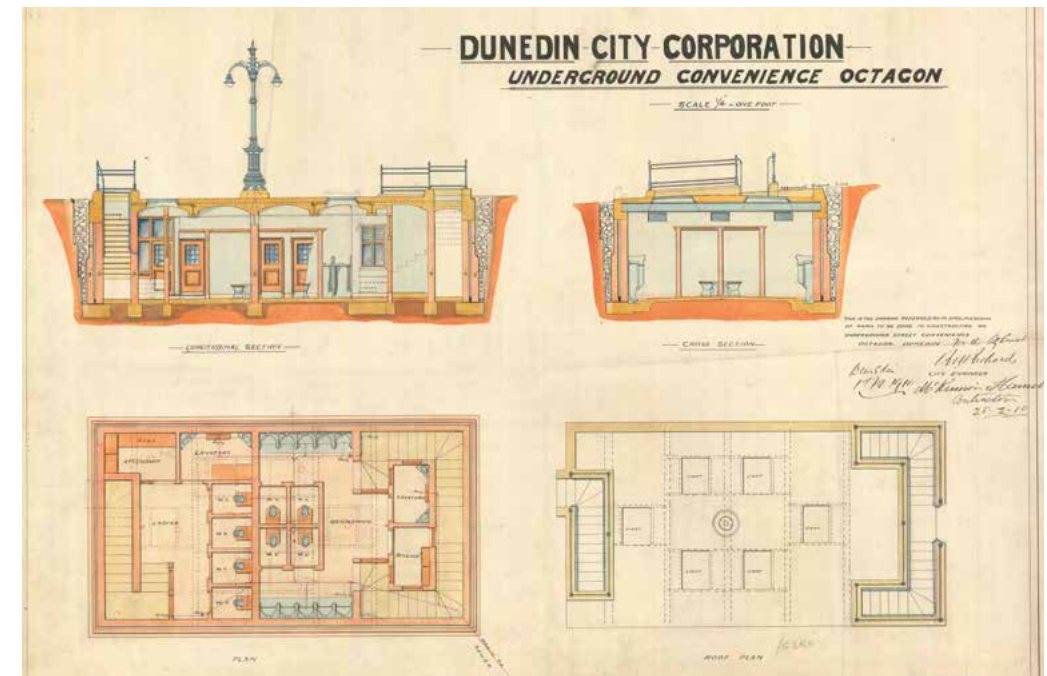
Octagon Underground Convenience Plans 1909, Plan 4427, City Engineers, DCC Archives
